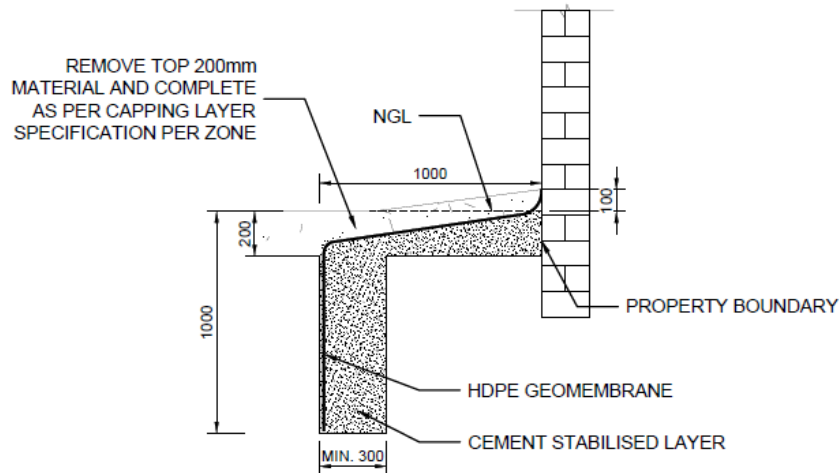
Typical detail of perimeter rodent barrier
